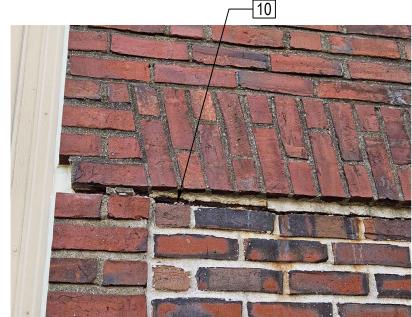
VIEW OF RUST JACKING AT MASONRY INFILL
